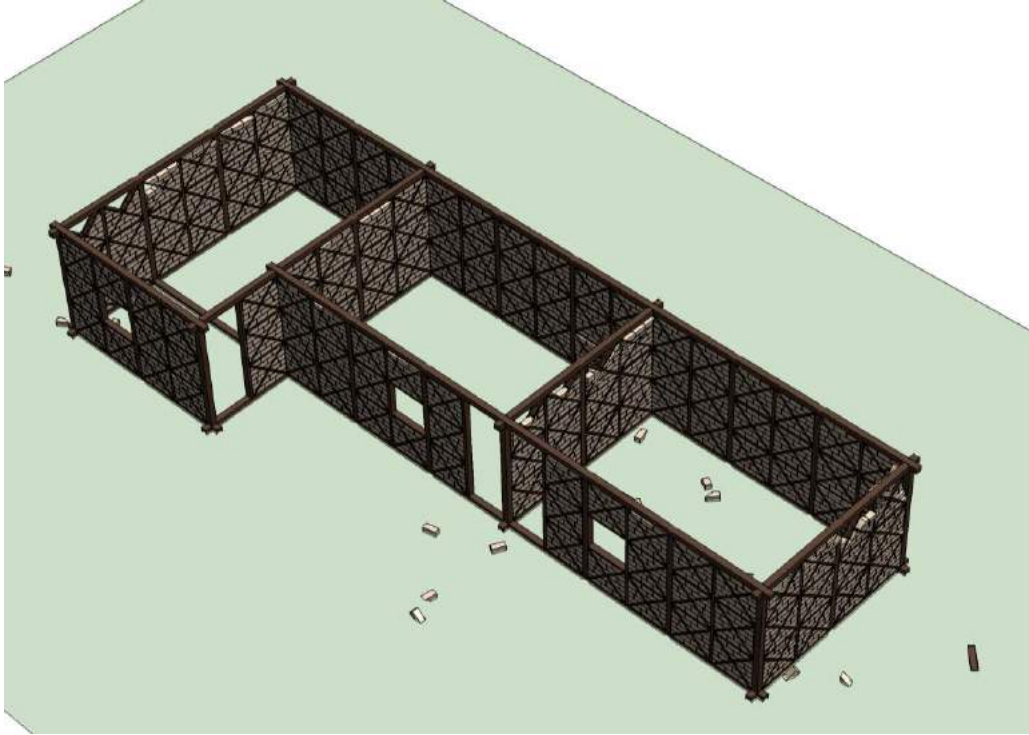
Damage to walls of Dhajji with nailed connections (PEER 828, tri-directional earthquake, See Appendix D7). (Roof not shown for clarity)
